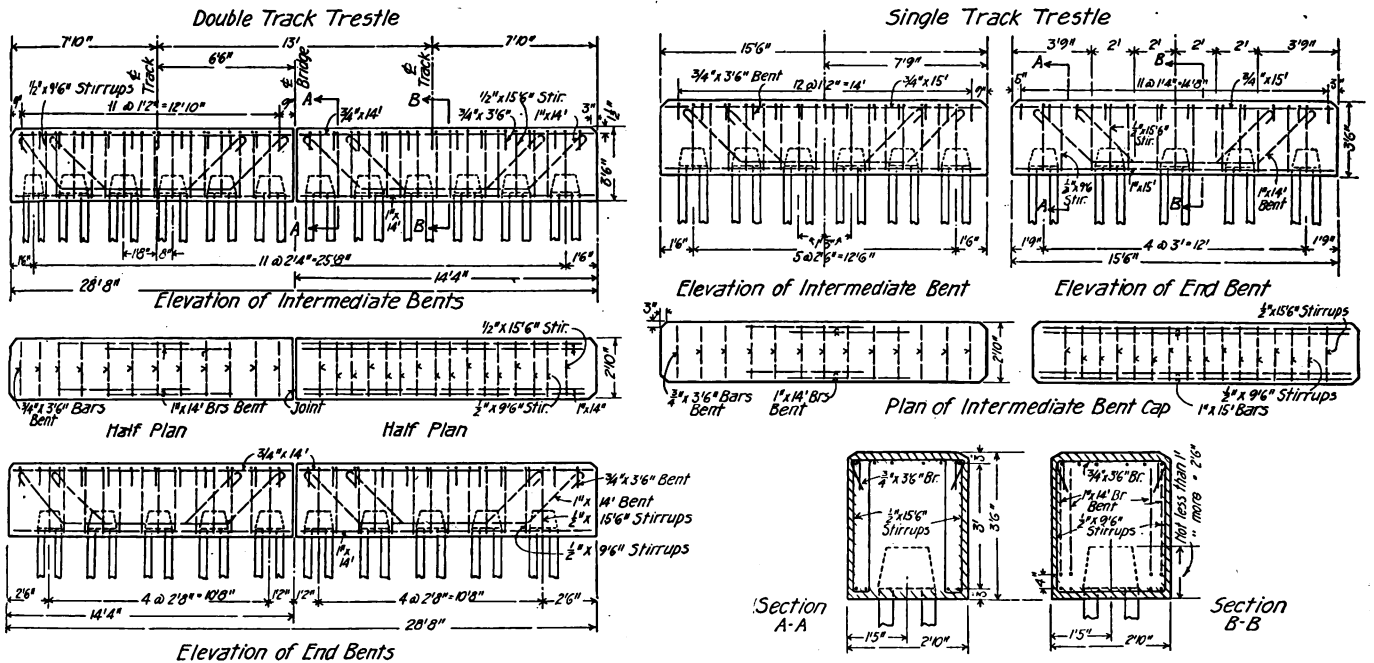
General Plans of Standard Reinforced Concrete Pile Trestle Bents, C., M. & St. P. Ry.
